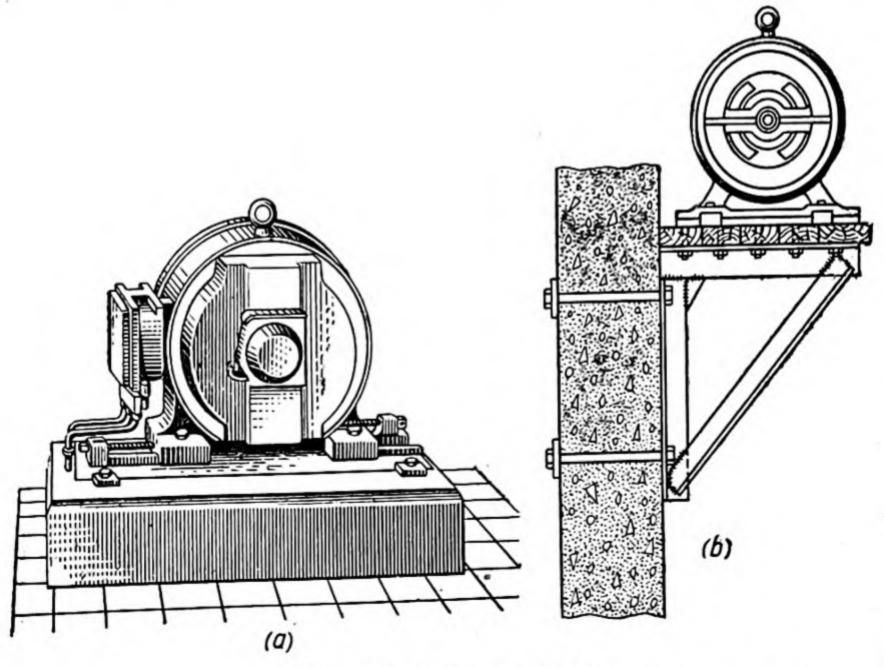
Motor mounting: a—on concrete block foundation, b—on a wall with the use of a bracket.
